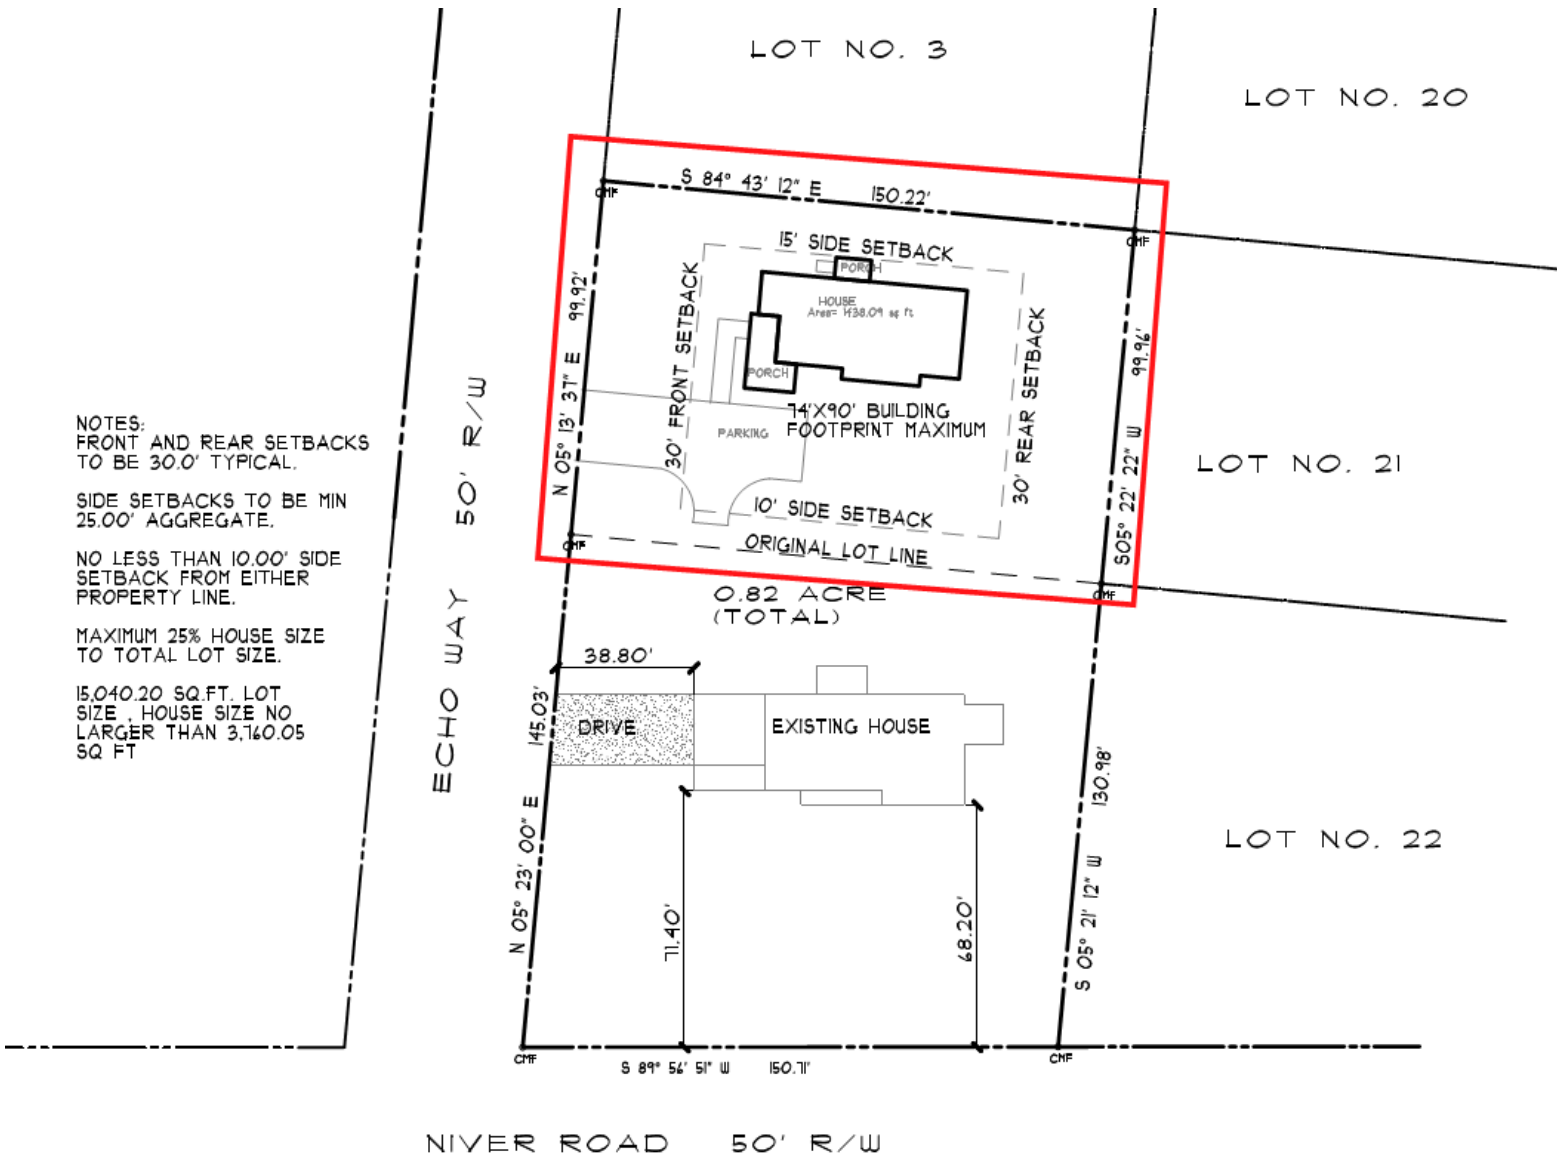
Exhibit E: "Orchard Hills" Subdivision Plat (surveyed in 1959) (Original Subdivision of Subject Site Outlined in Red)
